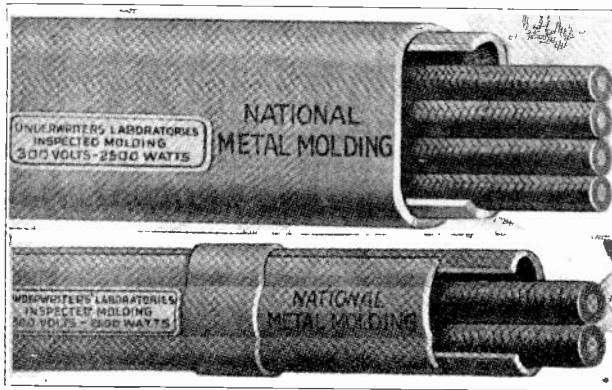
Another type of metal molding with a removable cap or cover strip, which can be placed on after the wires are insulated.
